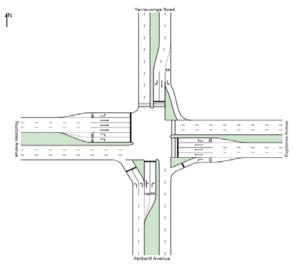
Sidra Model Layout Roystonea Avenue / Chung Wah Terrace Extension / Yarrawanga Avenue Intersection
